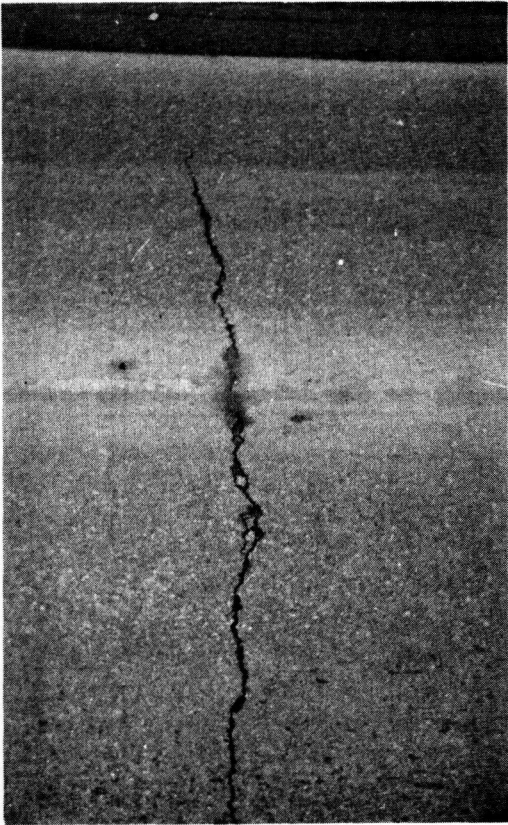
Reflected transverse crack in resurfaced asphaltic concrete pavement, although apparently only after about five years. Heavy trucks are observed to drive with the outer wheels near the pave-
